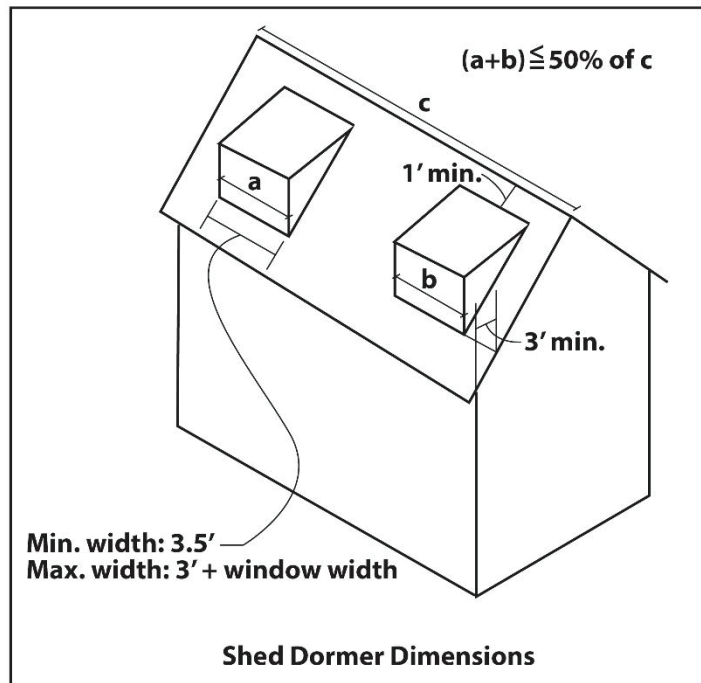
o.6: Shed Dormer Dimensions
